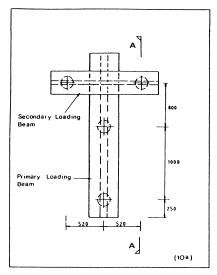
General arrangement of minipiles and anchors, B.R. Bridge 17, Romsey
